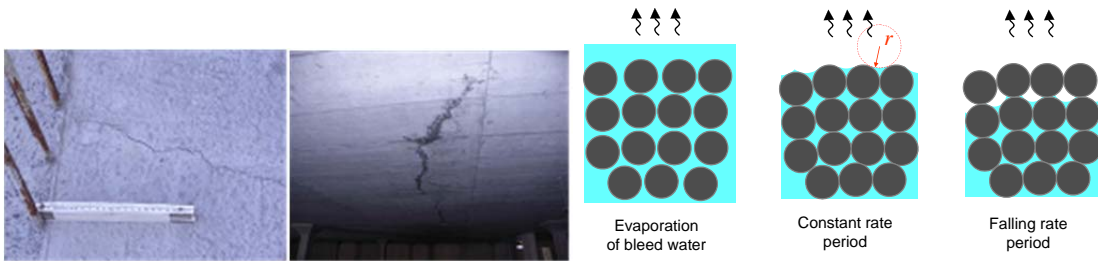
a) plastic shrinkage cracks through concrete slab (Lura et al. 2011) and b) phases of drying of fresh concrete (Lura et al. 2007).
